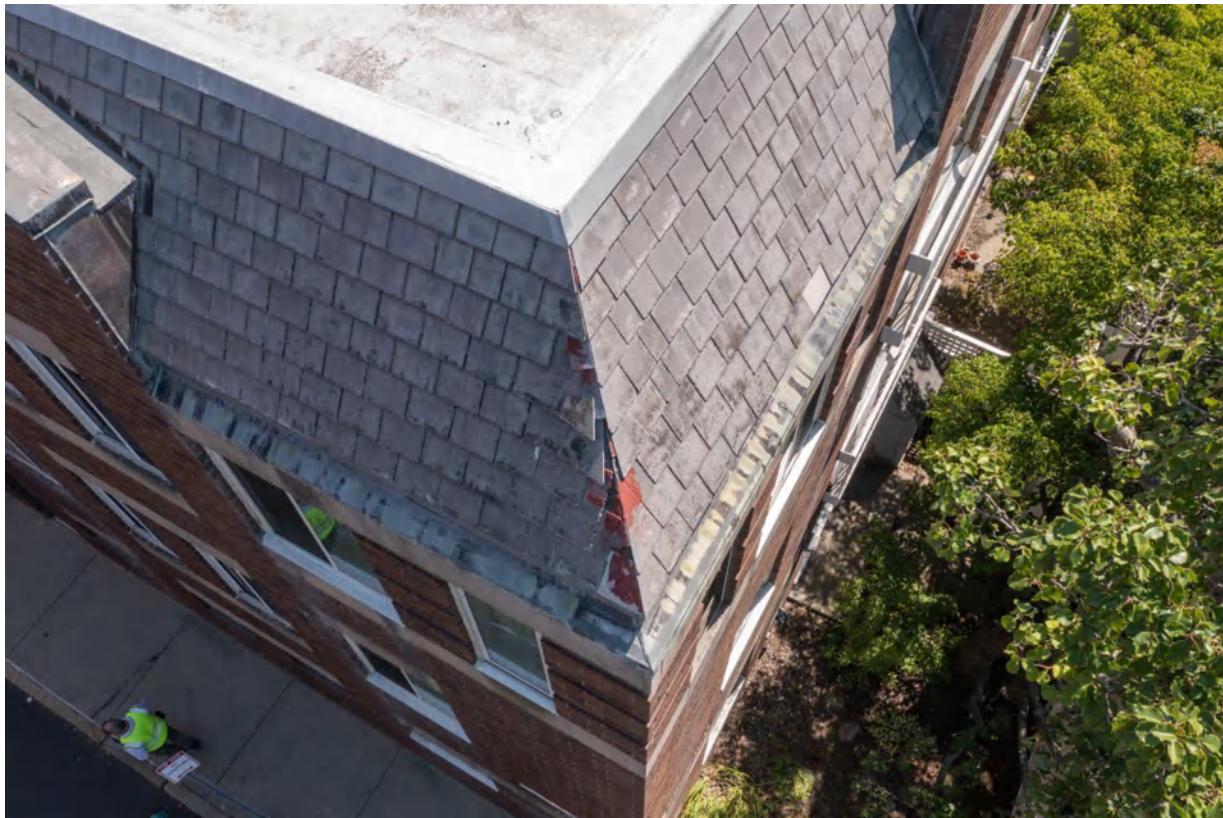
damaged/missing shingles at the southwest hip area of the steep sloped mansard style roof from reported tree impact
